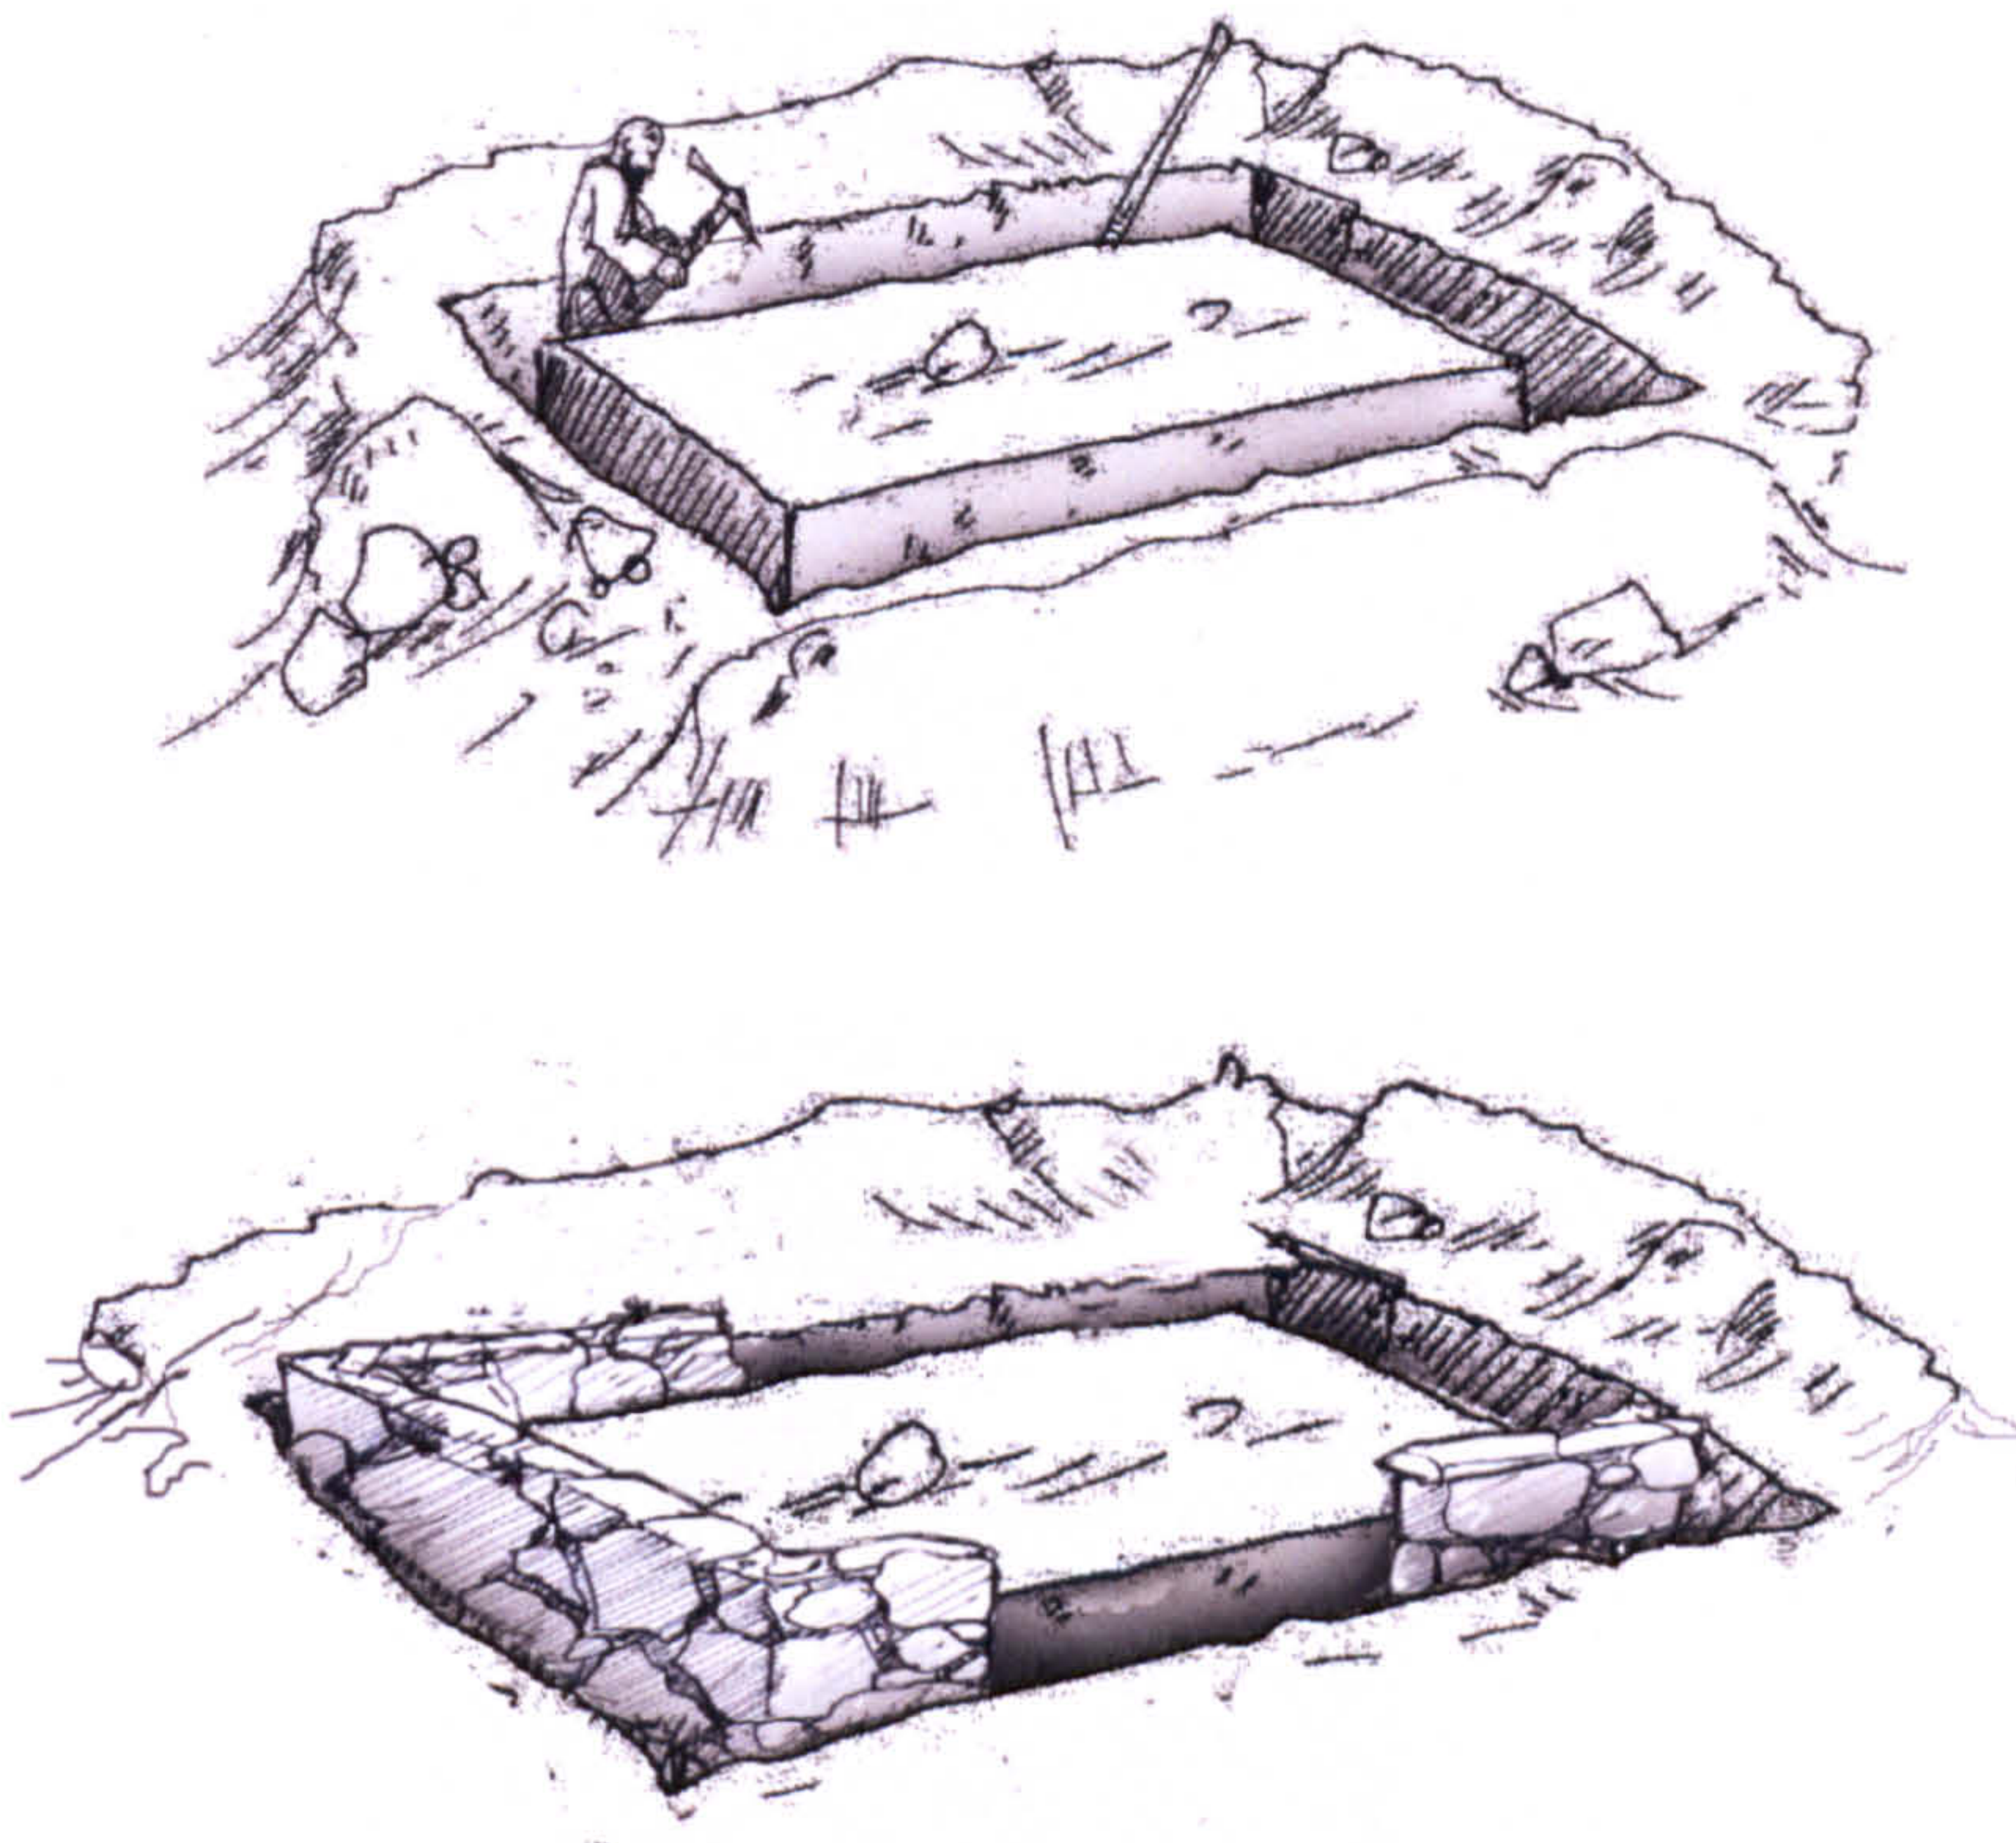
Drawing showing how Baluch builders first excavate a wide trench for their buildings. Source: Author
